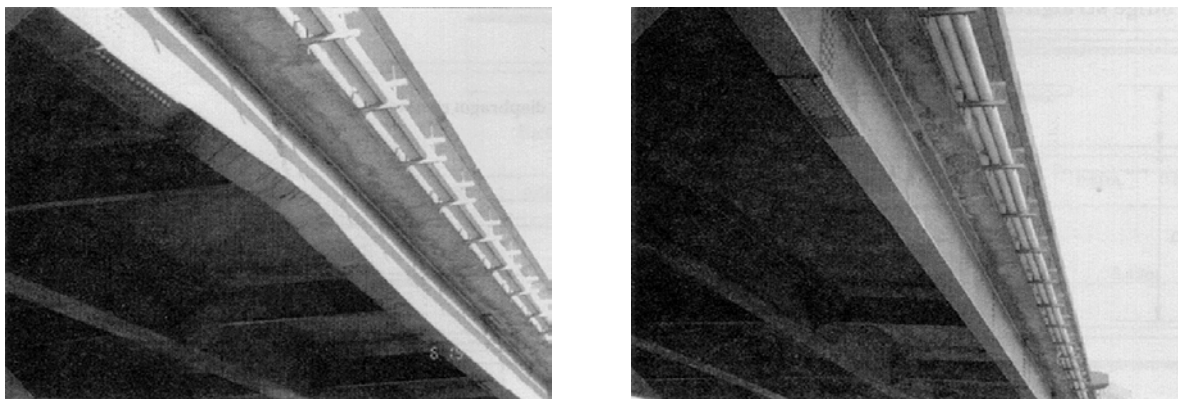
Damaged bridge steel girder before and after repair
